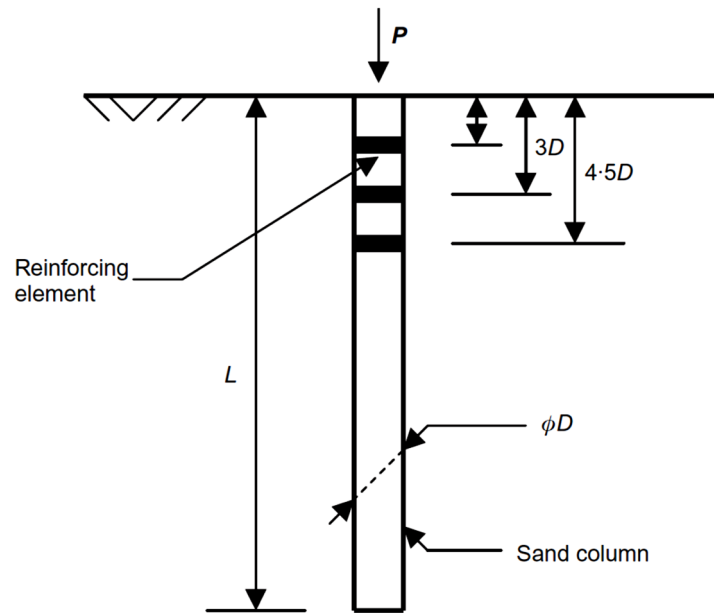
Horizontal meshes placed within sand column to act as reinforcing elements
